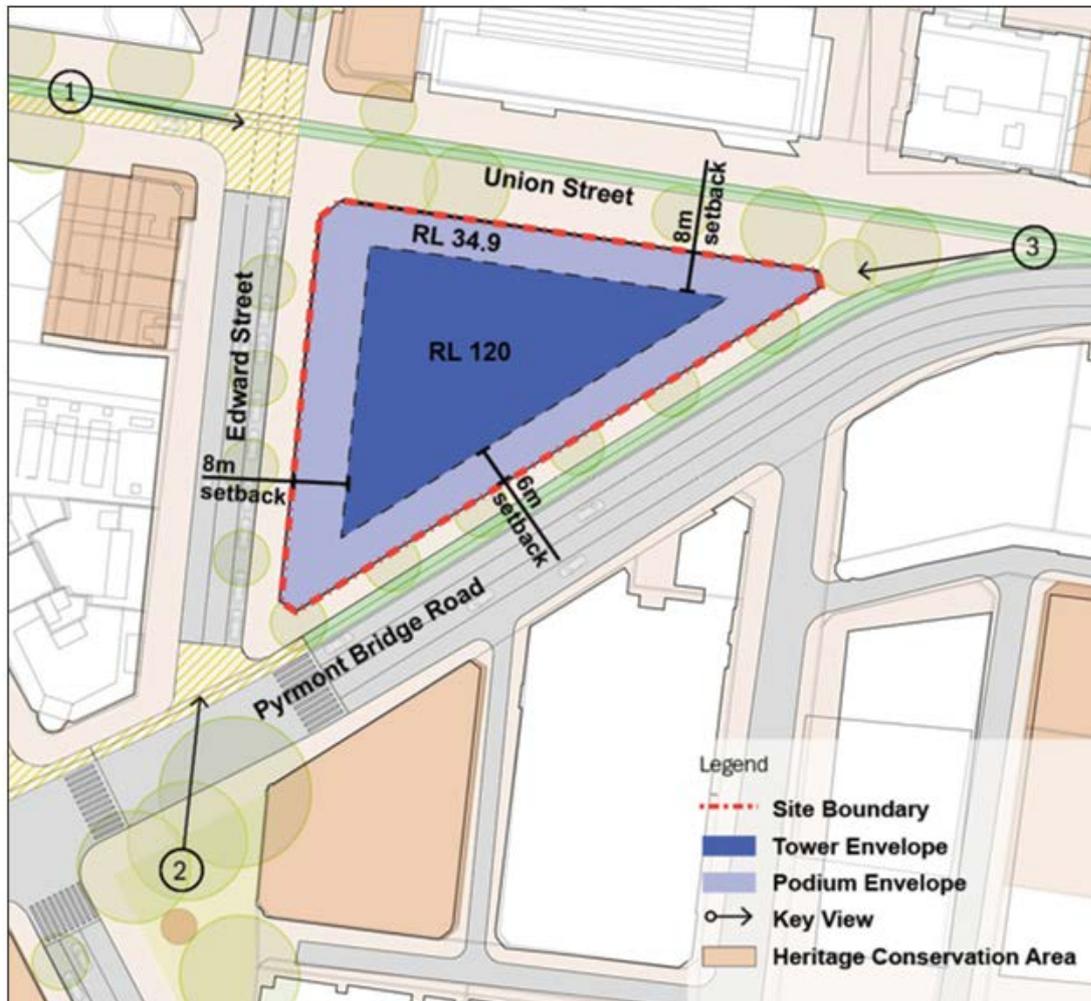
Revised Building Envelope Plan for ‘metro east site’ at 37-69 Union Street
